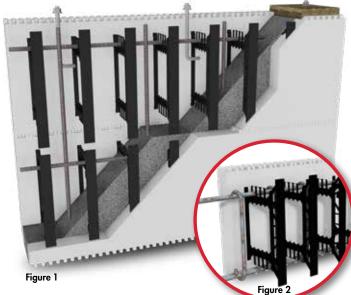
BuildBlock ICF wall section cutaway showing horizontal and vertical steel placement, alternating rebar placement to hold vertical rebar, J-bolts mounted in the concrete and a wooden top plate.
